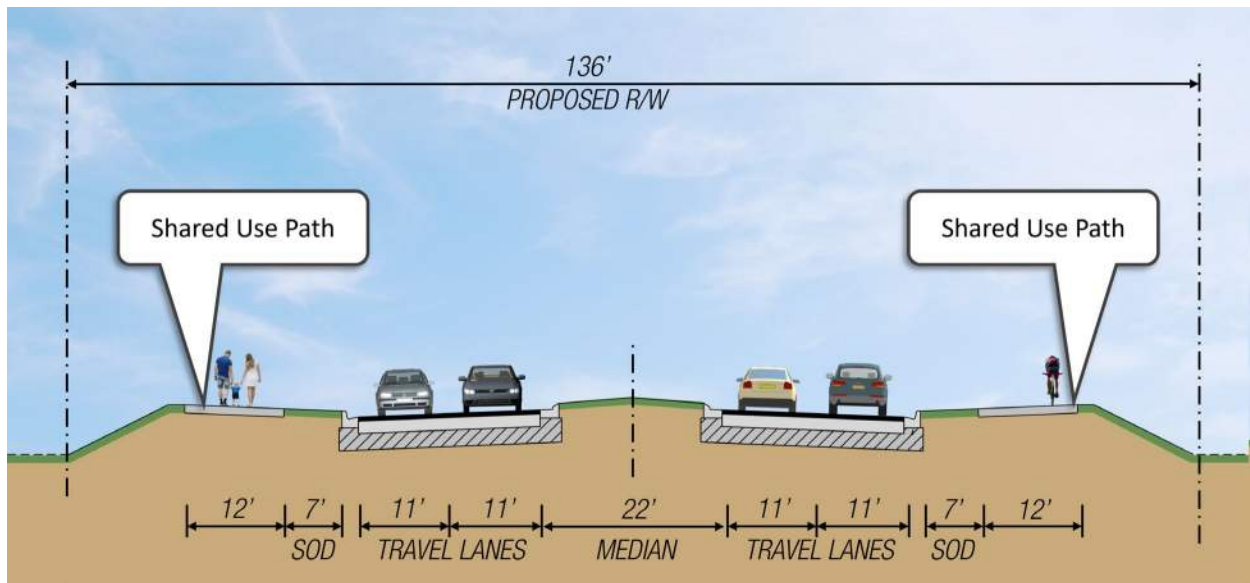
Preferred Alternative SR 72 (Clark Road) typical section
